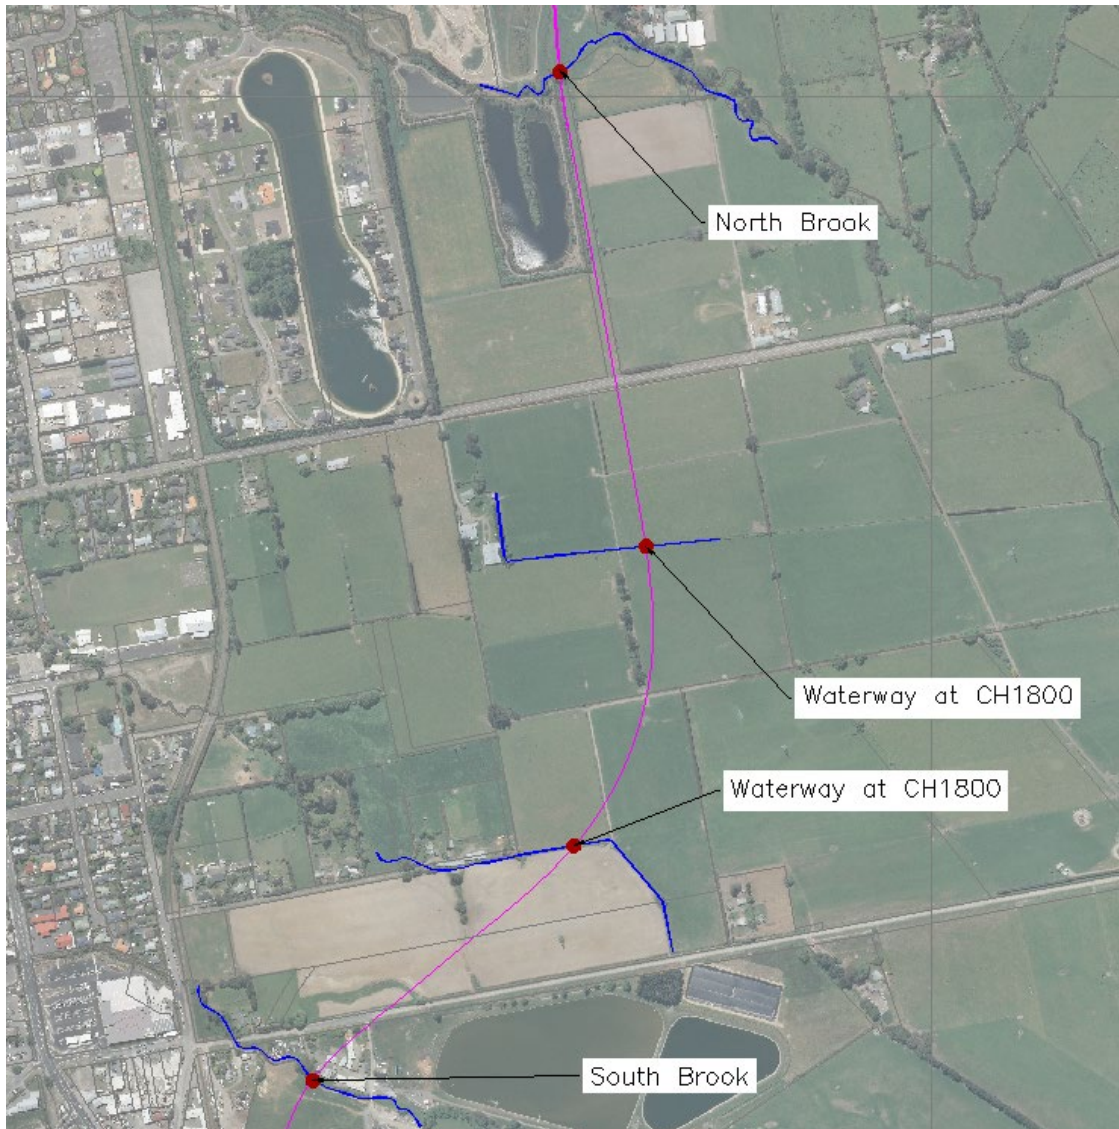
Locations of the four-main waterway crossing through the proposed alignment
